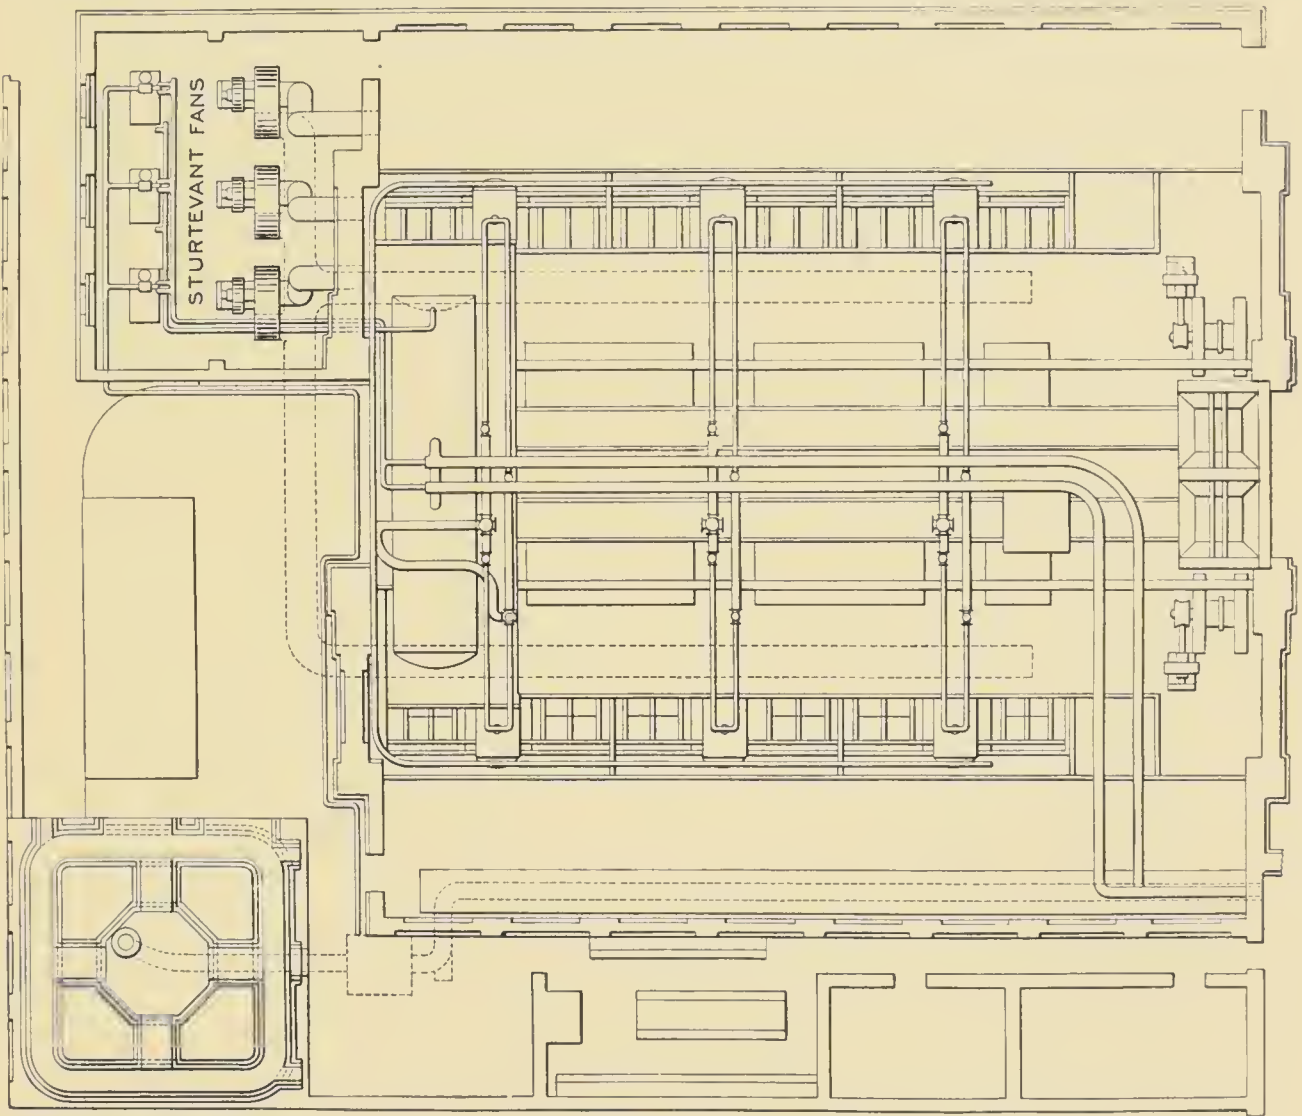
PLAN OF DESTRUCTOR HOUSE, SHOWING STURTEVANT FANS AT SHOREDITCH, LONDON, ENG.
